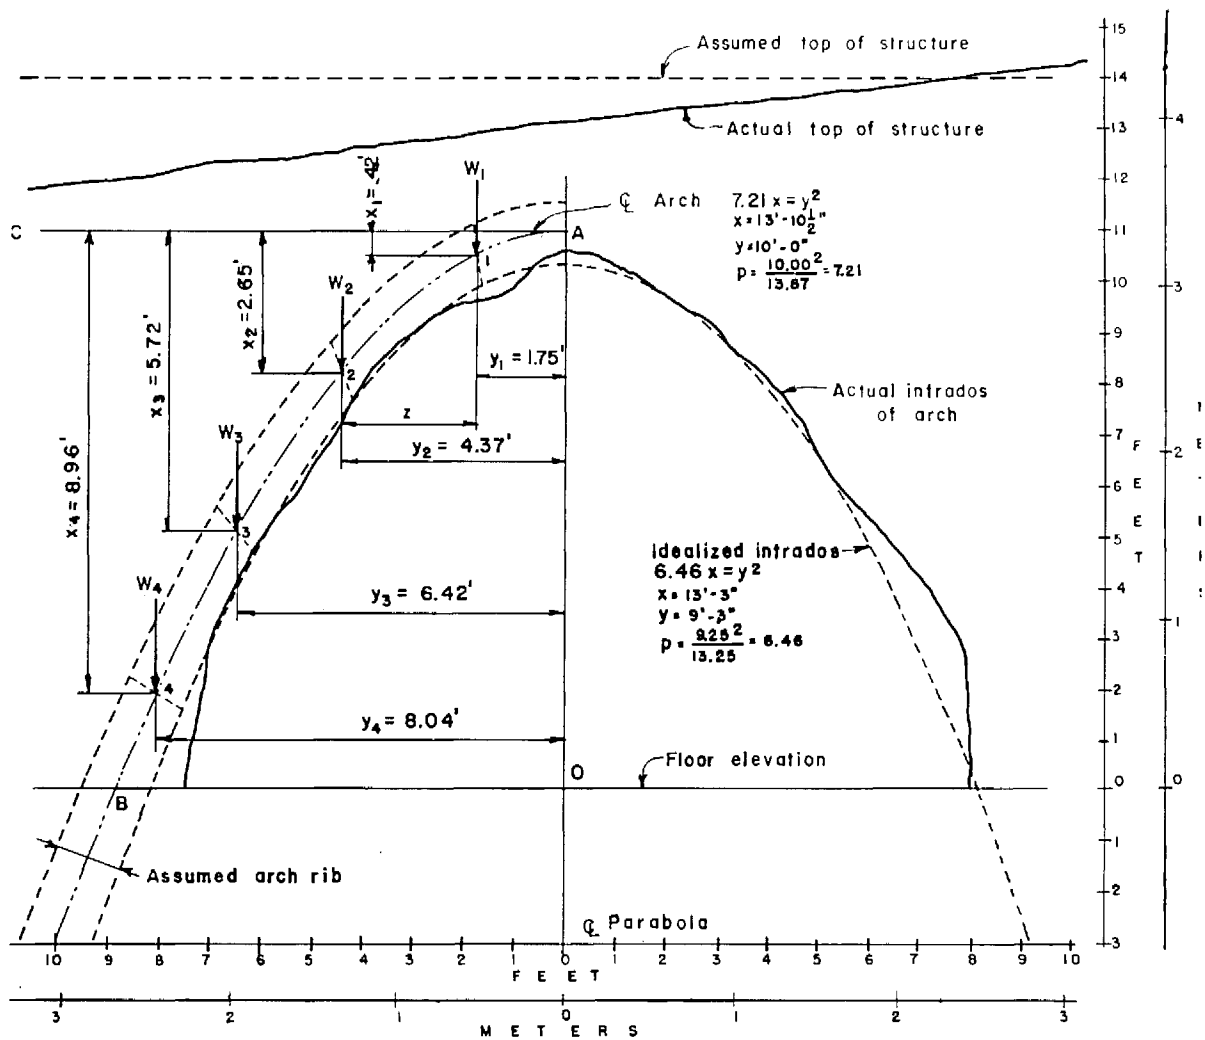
Section through corbelled vault, Round Building, Locus 421. Adapted from drawing of John Sanders.
